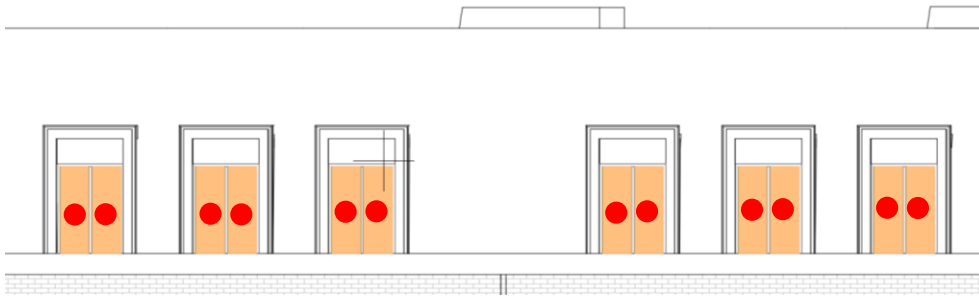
Apartment Type 1 South Facing Elevation: Location of Openings
